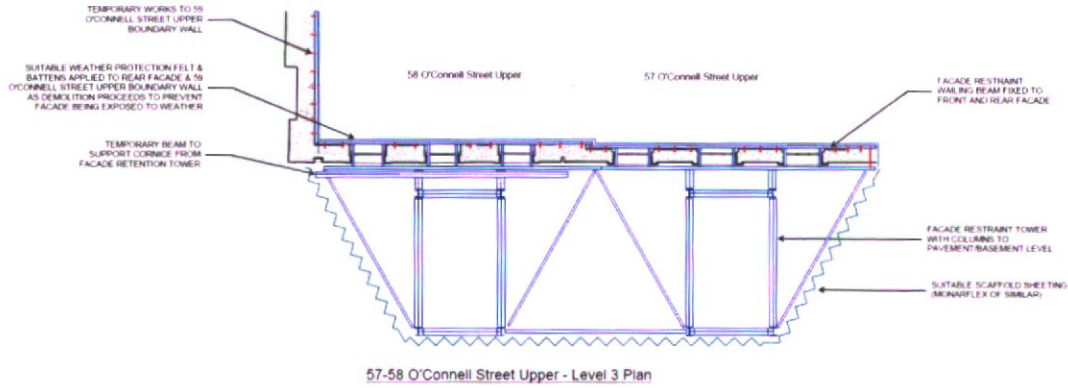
57-58 O’Connell Street Upper (Plan – Typical Façade Restraint System)
